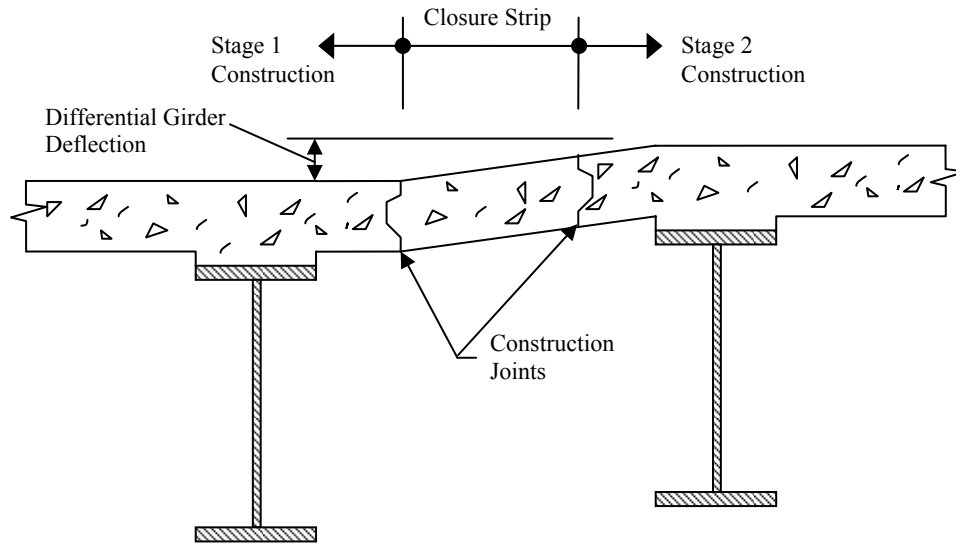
Misalignment of Deck Slab due to Differential Non-composite Deflections
